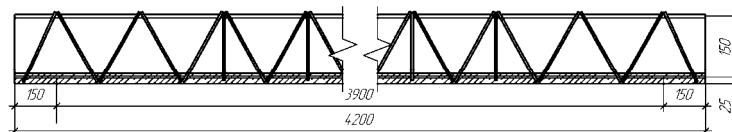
The construction of reinforced concrete deck form floor slabs of grades P-1 and P-2
